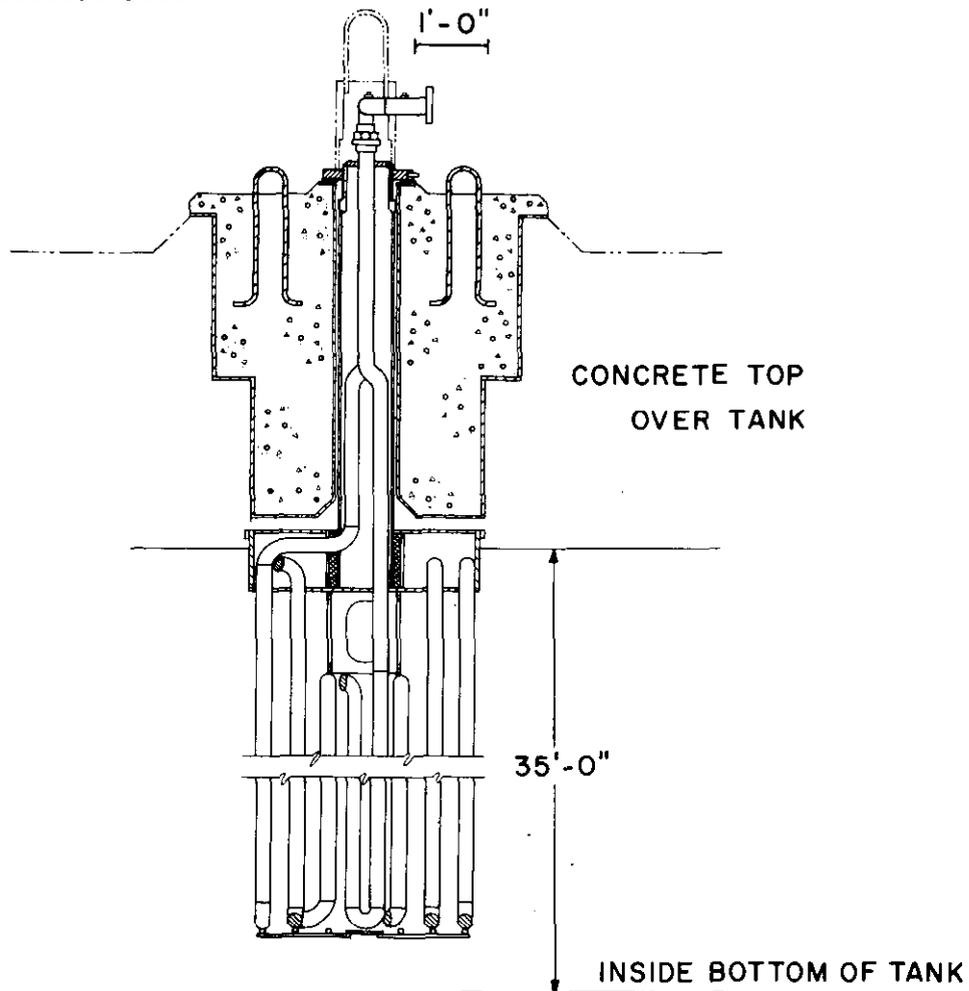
Removable Cooling Coil, Type III Tanks
